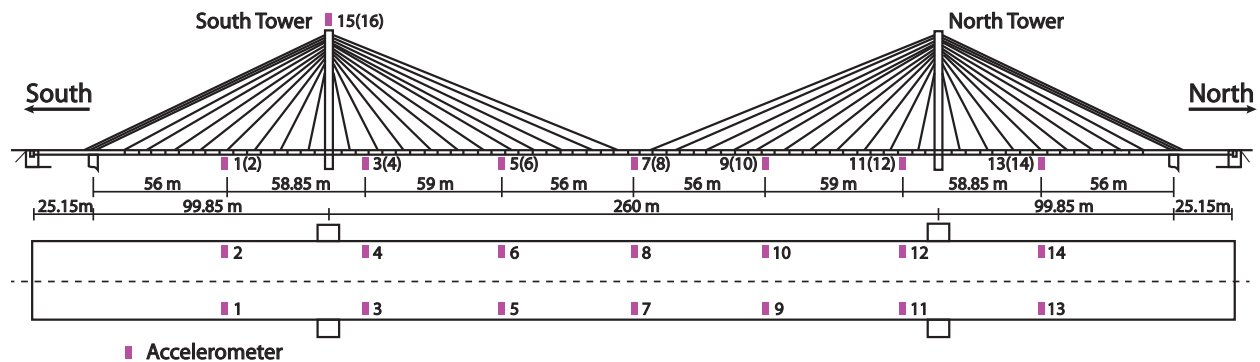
Cable-Stayed Bridge: Dimensions and Instrument Layout. One of the earliest cable-stayed bridges constructed in mainland China, the bridge consists of a main span of 260m and two side spans of 25.15+99.85 m each. The bridge was upgraded with an SHM system that includes more than 150 sensors, including 14 uniaxial accelerometers, 1 biaxial accelerometer, an anemoscope, a temperature sensor, and optical fiber Bragg grating sensors. This figure was adapted from a similar figure in Li et al. (2013).
